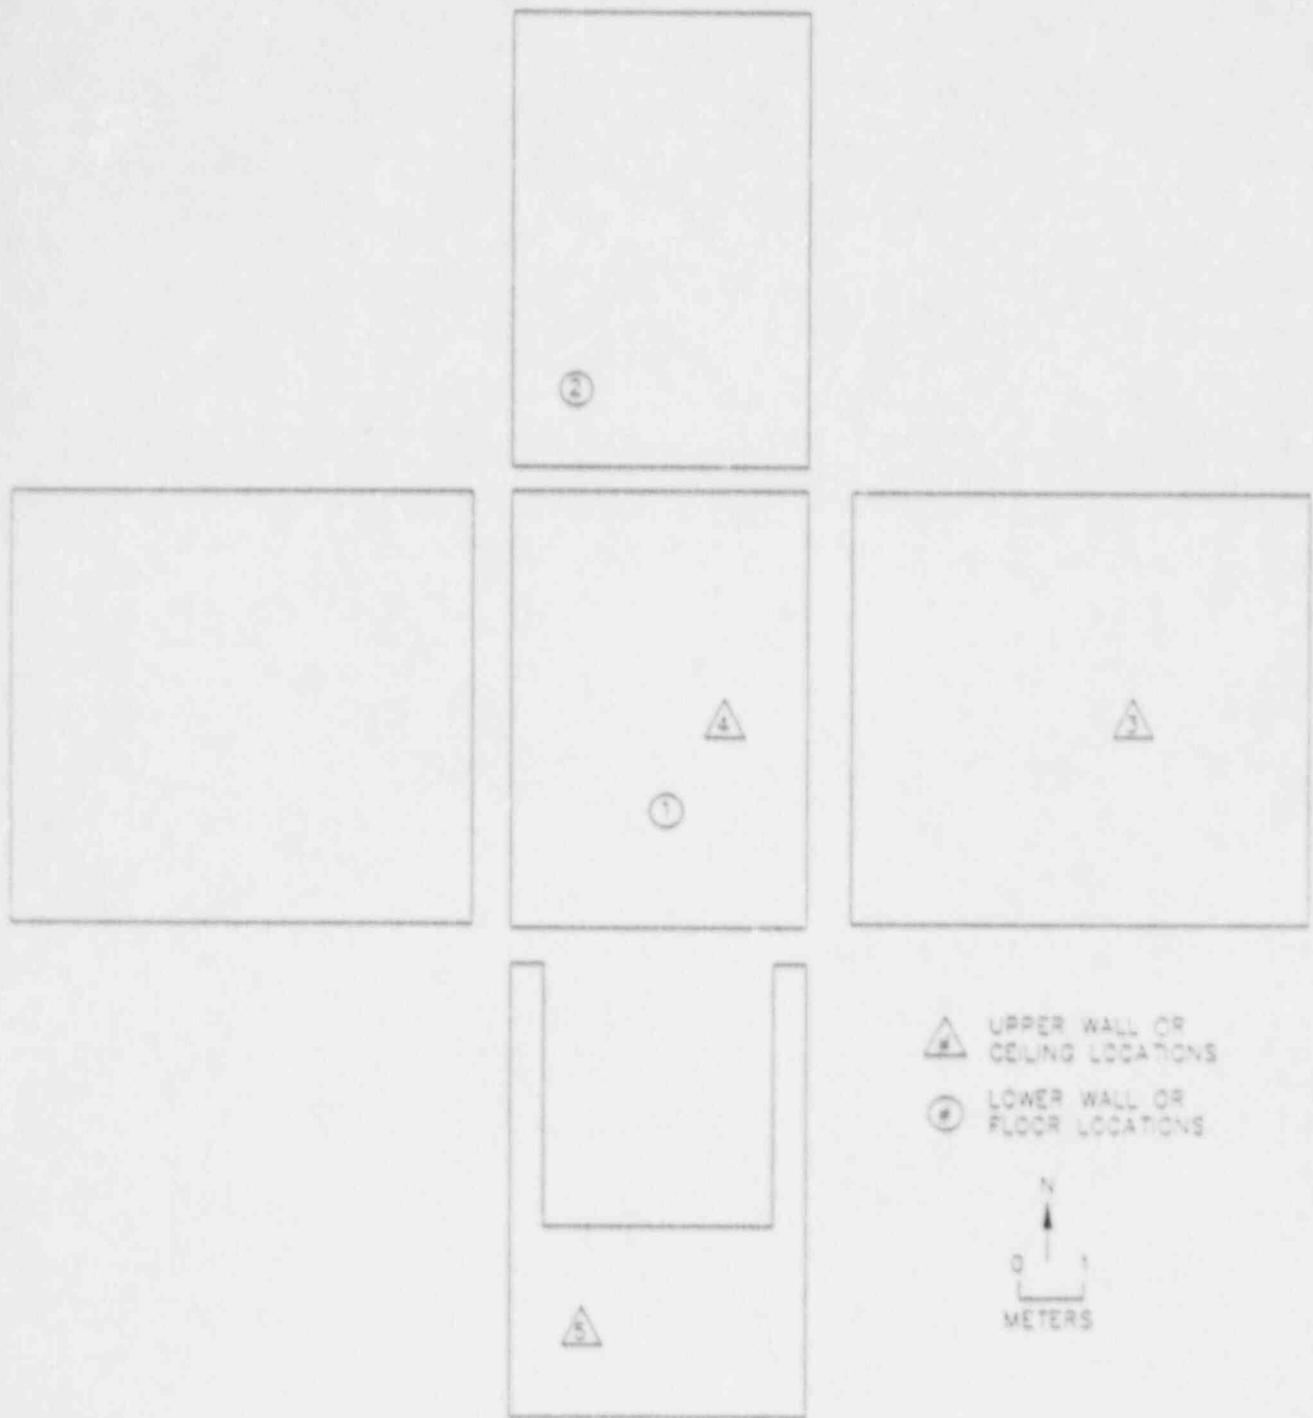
Fire Equipment Room Showing Locations of Single-point Measurements
